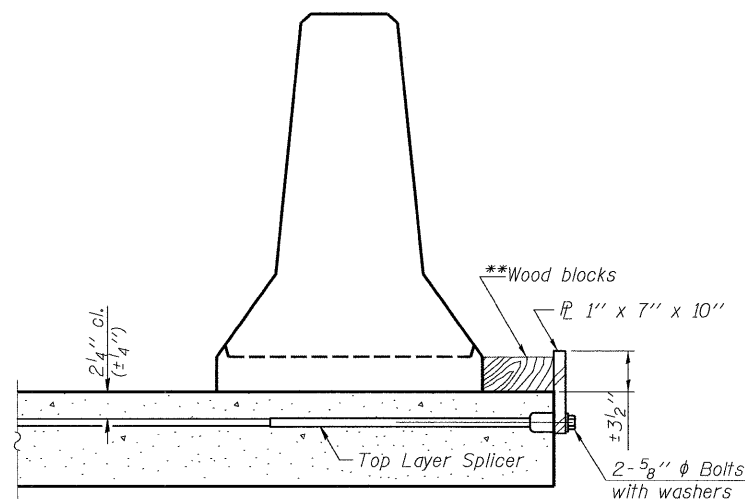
Detail I - With Bar Splicer or Couplers: Connect one (1) 1"x7"x10" steel PL to the top layer of couplers with 2-5/8" φ bolts screwed to coupler at approximate C of each barrier panel.
